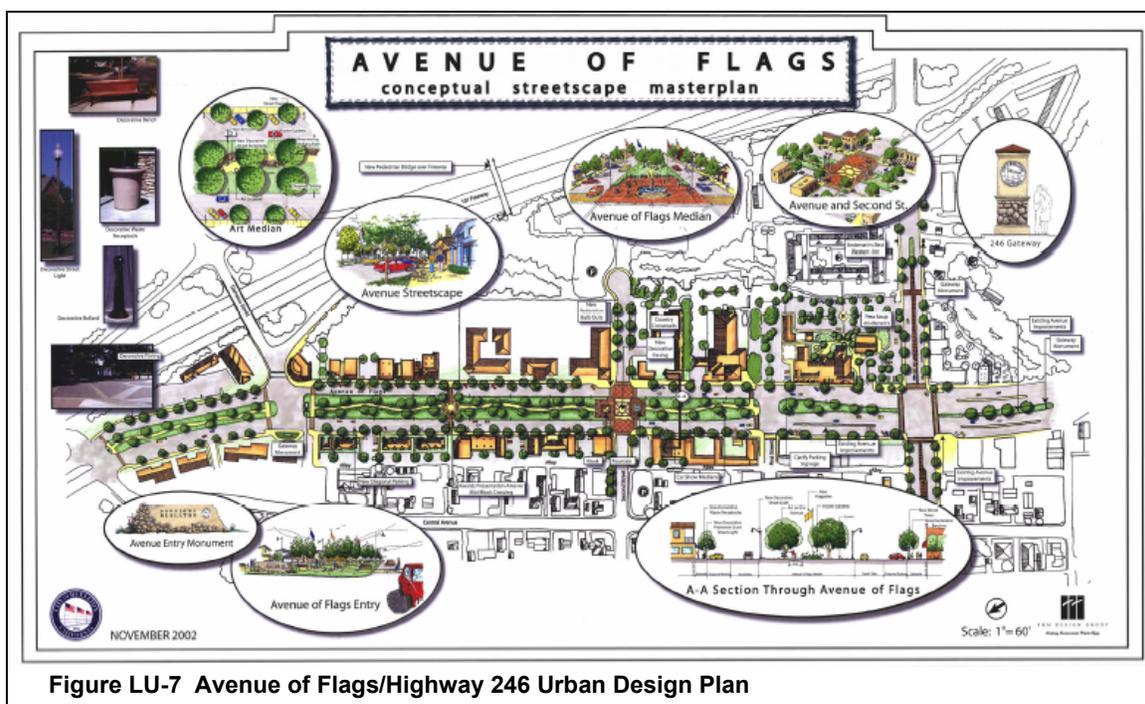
Avenue of Flags/Highway 246 Urban Design Plan
